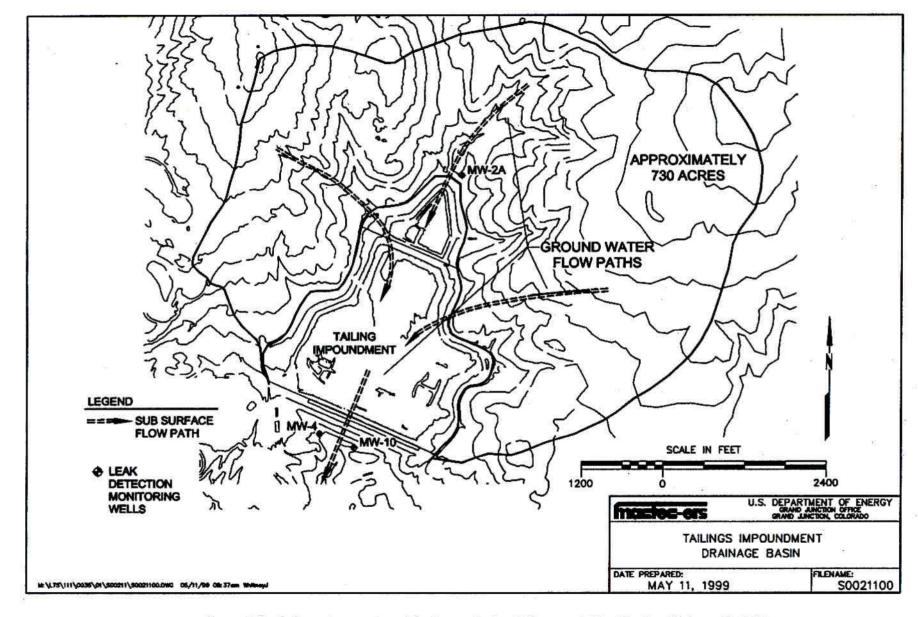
Tailings Impoundment Drainage Basin at Sherwood, Washington, Disposal Cell Site
